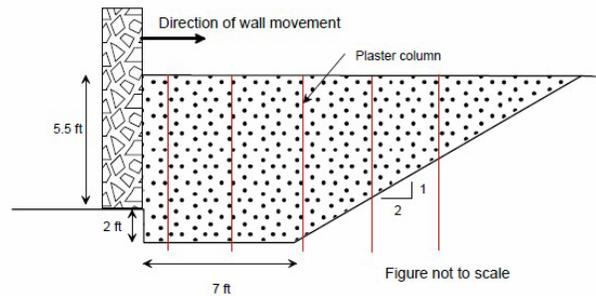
Schematic cross section through test specimen illustrating the shape of the excavated surface and backfill
